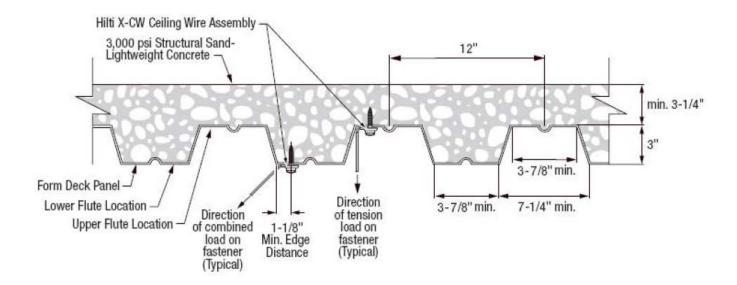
INSTALLATION LOCATIONS FOR HILTI X-CW CEILING WIRE HANGER ASSEMBLIES IN 3-INCH-DEEP COMPOSITE STEEL DECK PANEL
